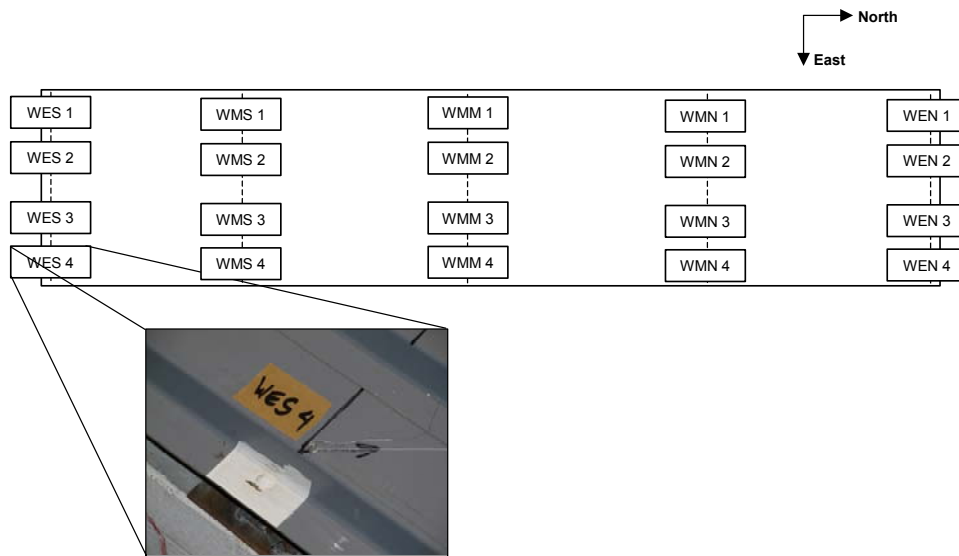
Locations and labels of welds with thin Hydrostone® coatings
